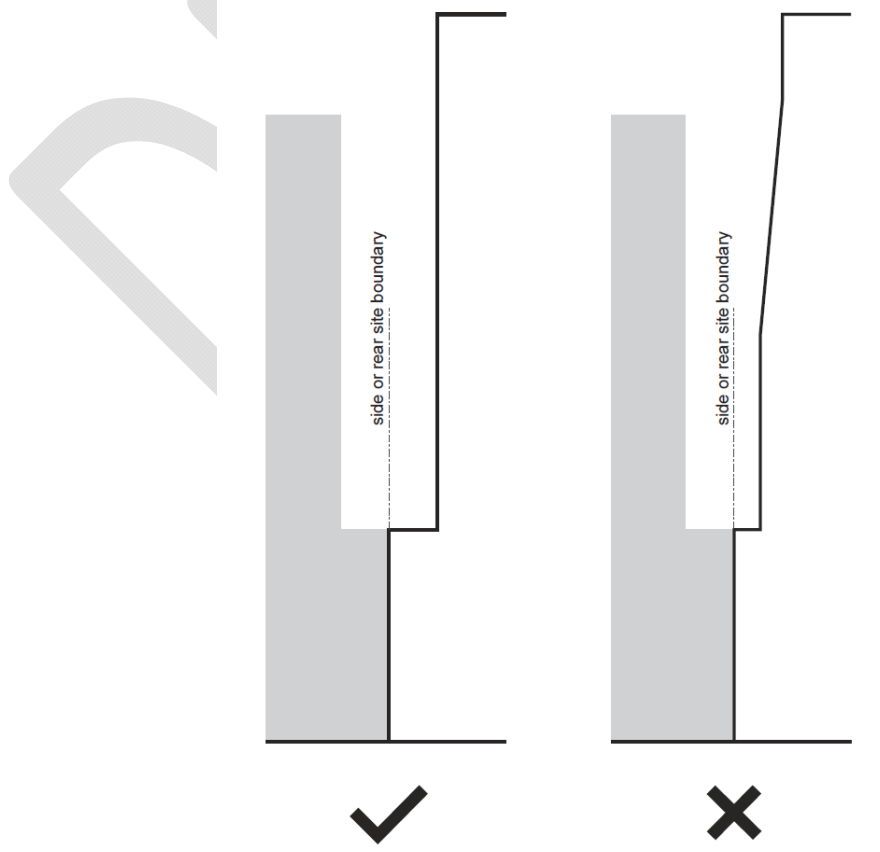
Minimum Side or Rear Setbacks above Street Frontage Height applied consistently to the top of the building not varying in cross section
